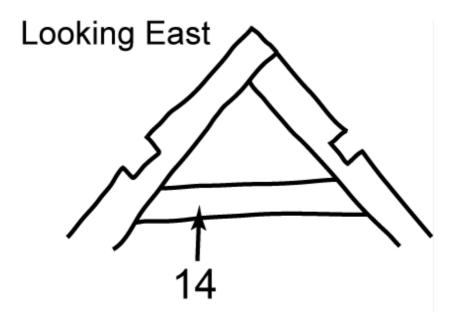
Sketch of truss 7, viewed looking east, showing sample location)
